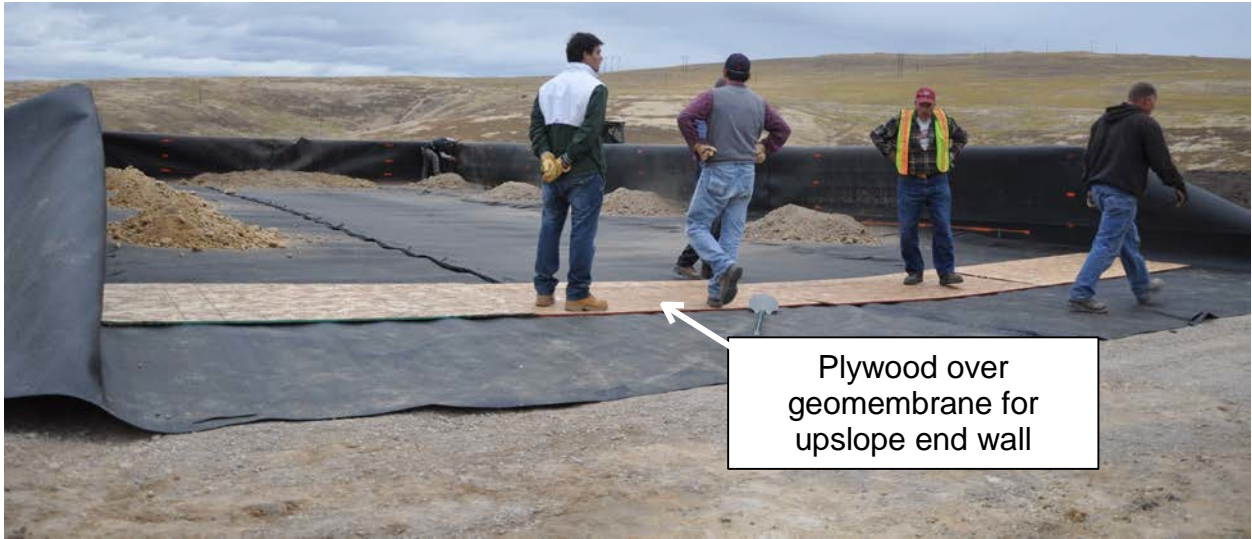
Plywood deployed over geomembrane at upper end of test section to prevent damage from equipment traffic.
